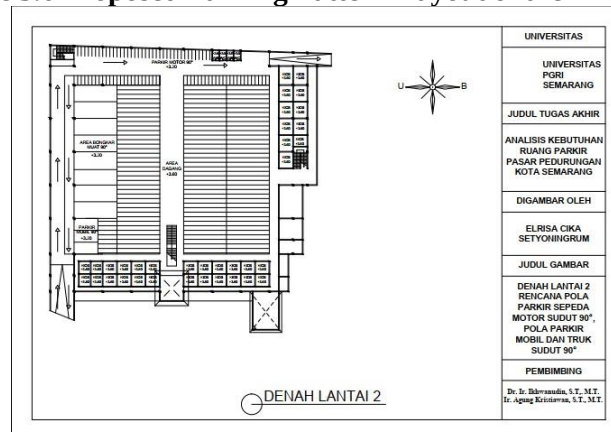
Proposed Parking Pattern Layout of the Second Floor
